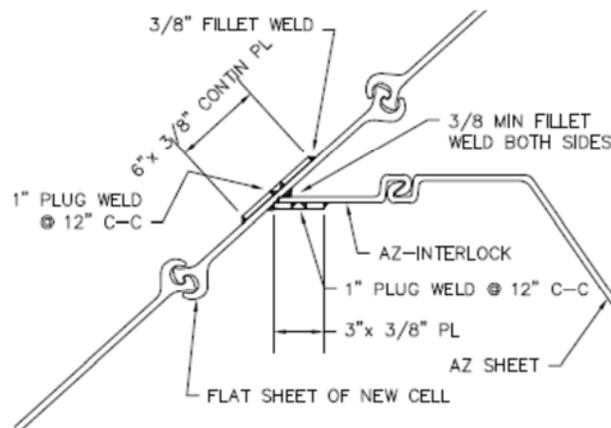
Detail showing interconnecting knuckles of flat sheets, and the reinforcement used to strengthen the junction pile “Y” connector
